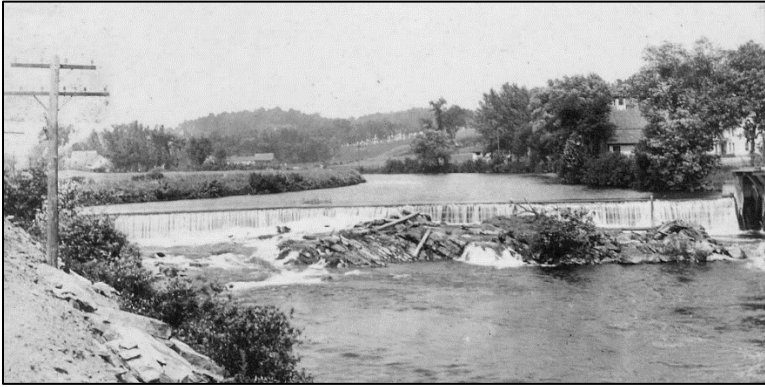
DAM AT TWIN STATE STATION NO. 1, ST. JOHNSBURY CENTER, C. 1920
